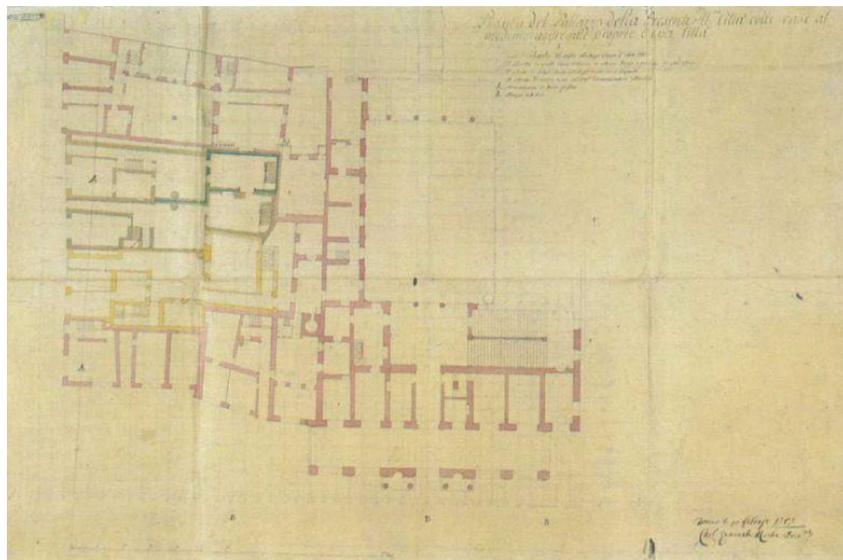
Carlo Emanuele Rocca (1757) Plan view survey of Palazzo di Città and the houses neighboring to Contrada Dora Grossa
